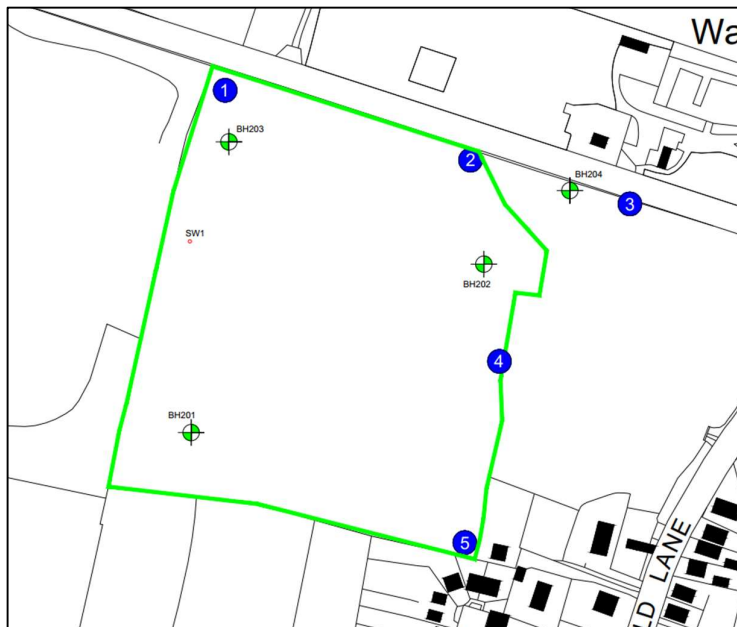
B: Site Plan (taken from AAe drawing 163407/D/006)
